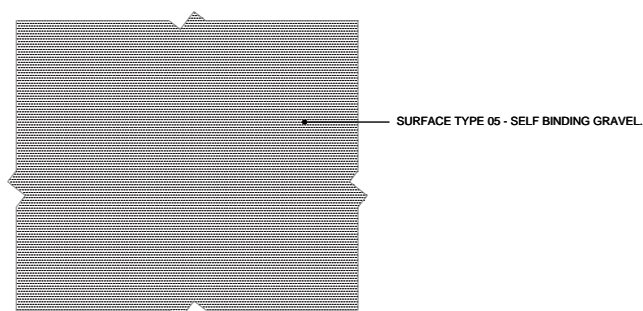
Surfacing Typical Detail (not to scale)
